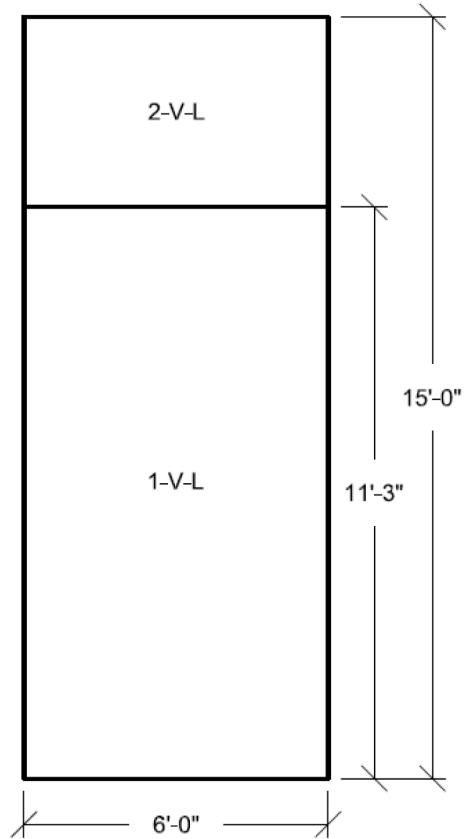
H.6-181 DGFO SV Wall 11 Looking From Outside
